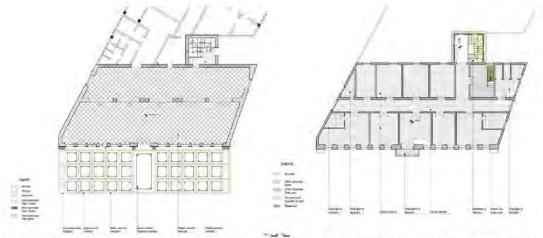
The ground floor (on the left) and the first floor (on the right) of "Grand Café" after the survey (Source: Author)
